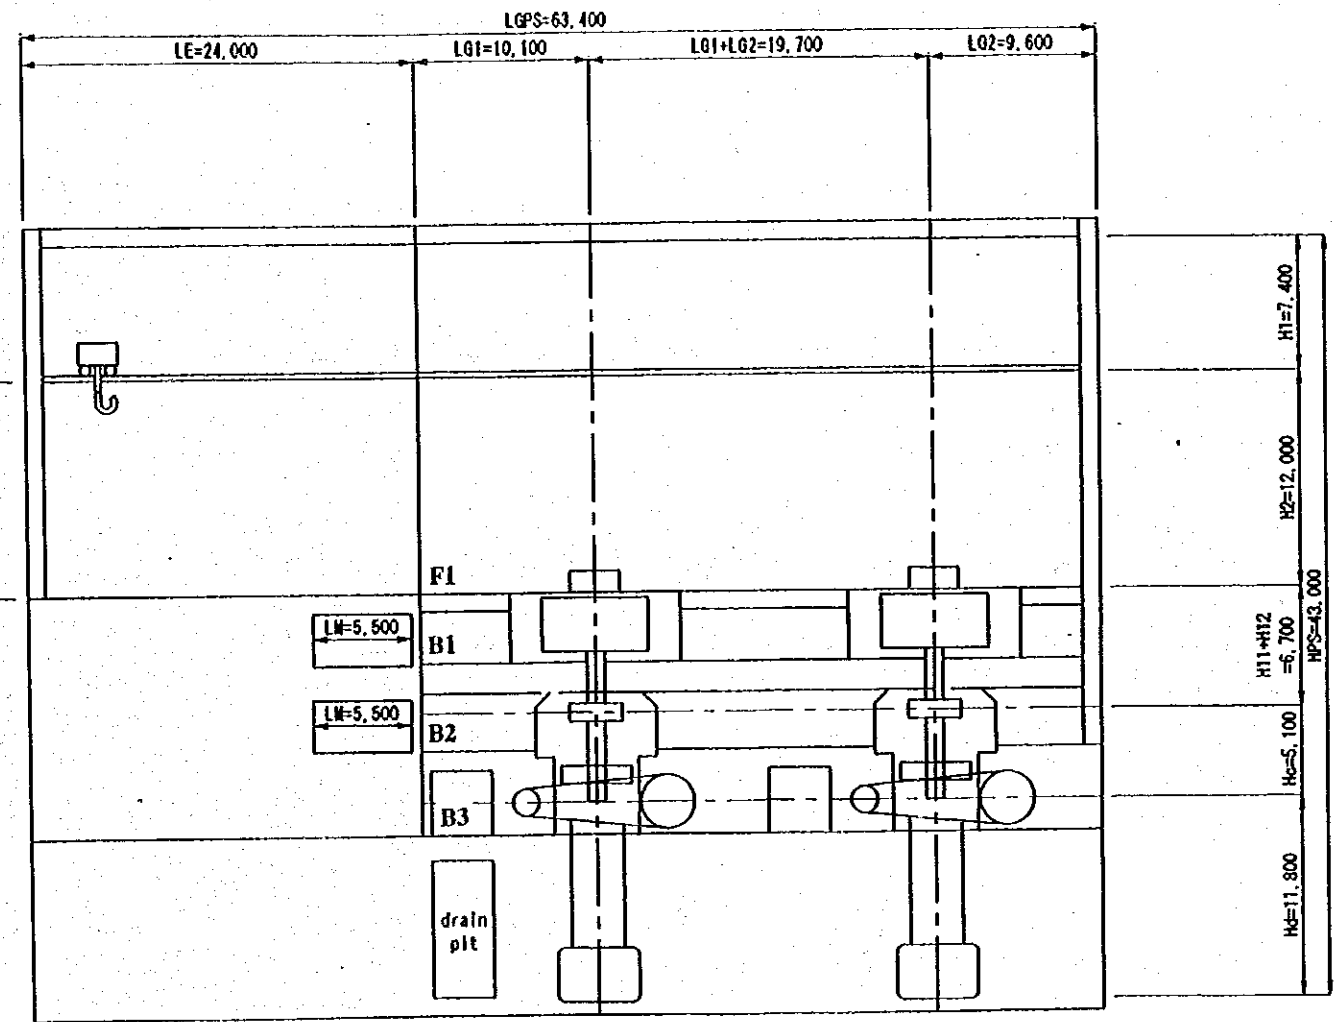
Plan and Section of Dong Nai No.3 Powerhouse
